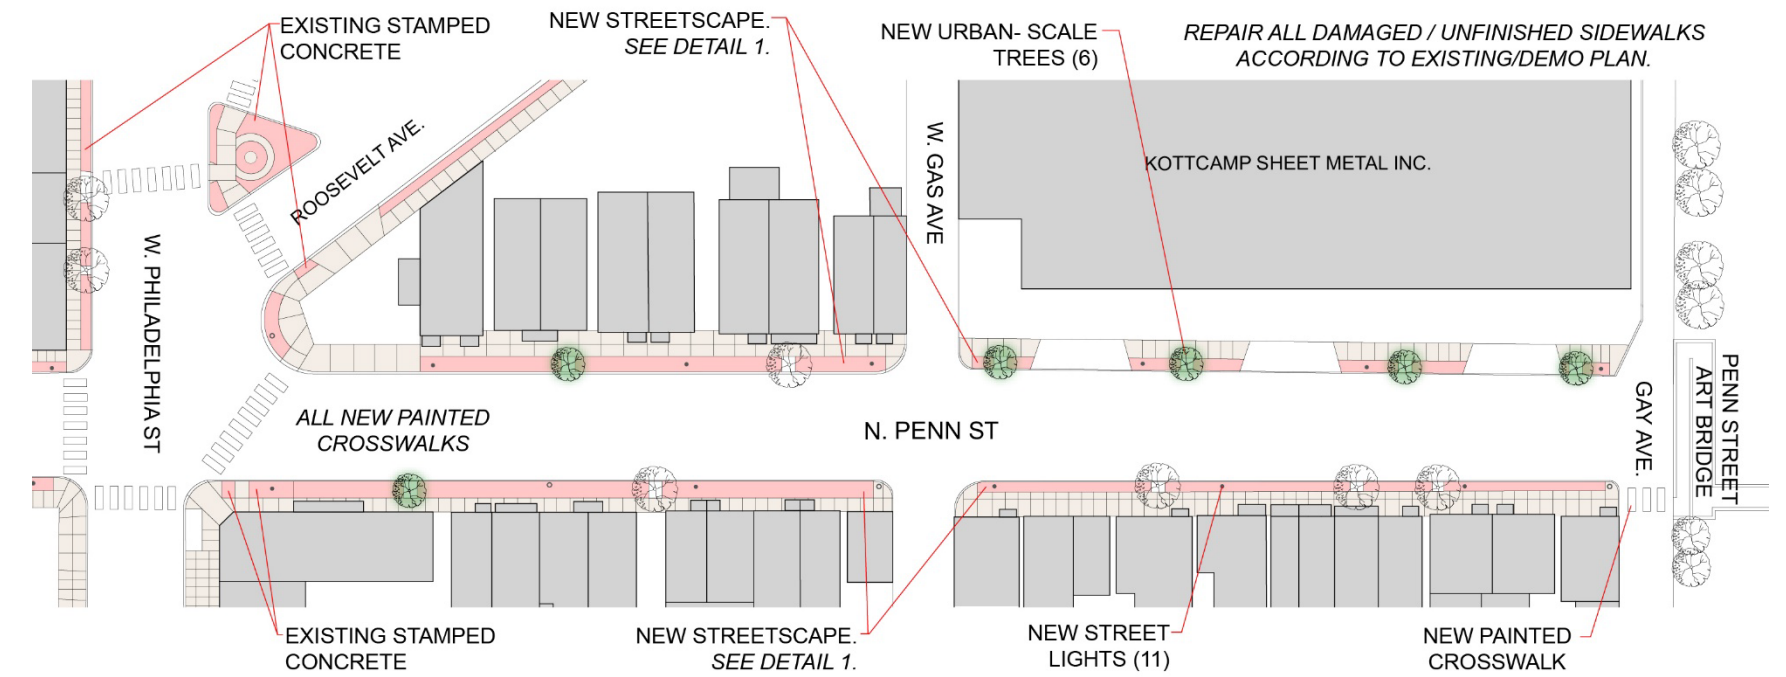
Walkability Diagram: West Market Street to West Philadelphia Street
